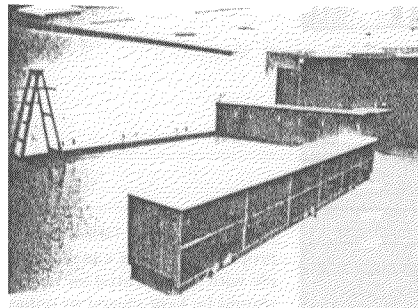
Anchorage must be provided for all counters whether they are located against a wall or out in the working spaces.
